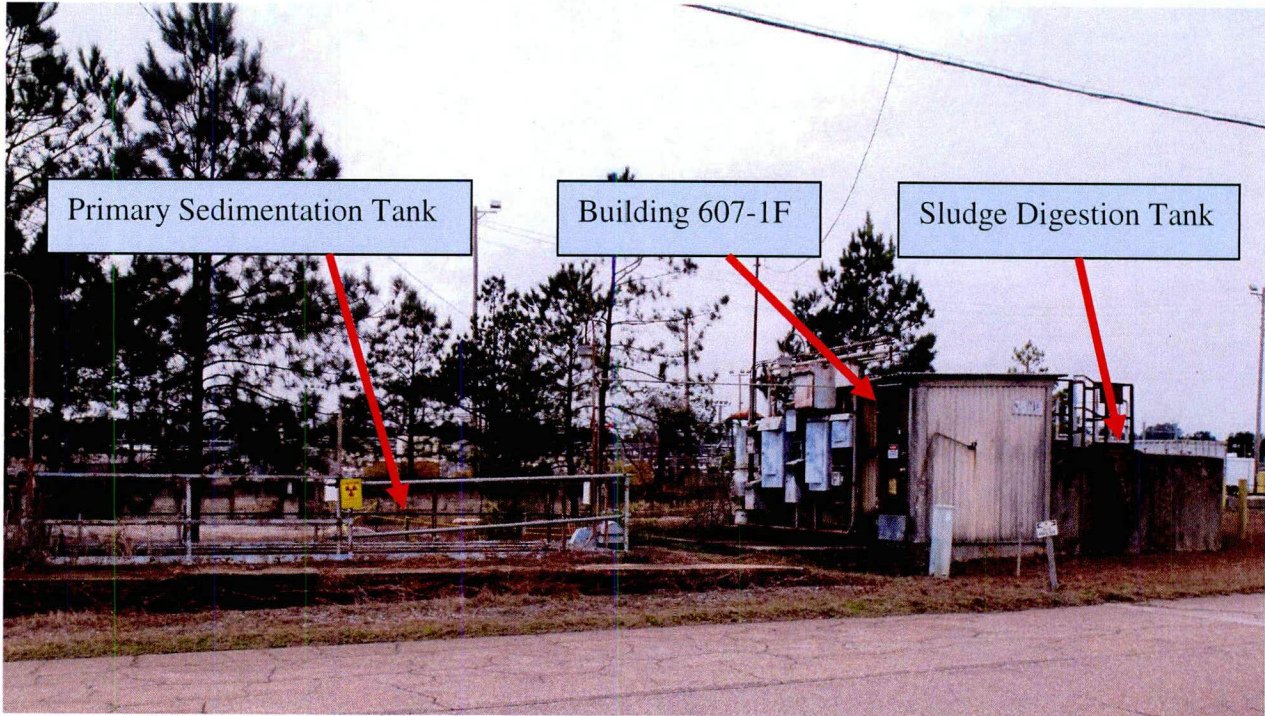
607-1F and Associated Facilities – Looking West-northwest
